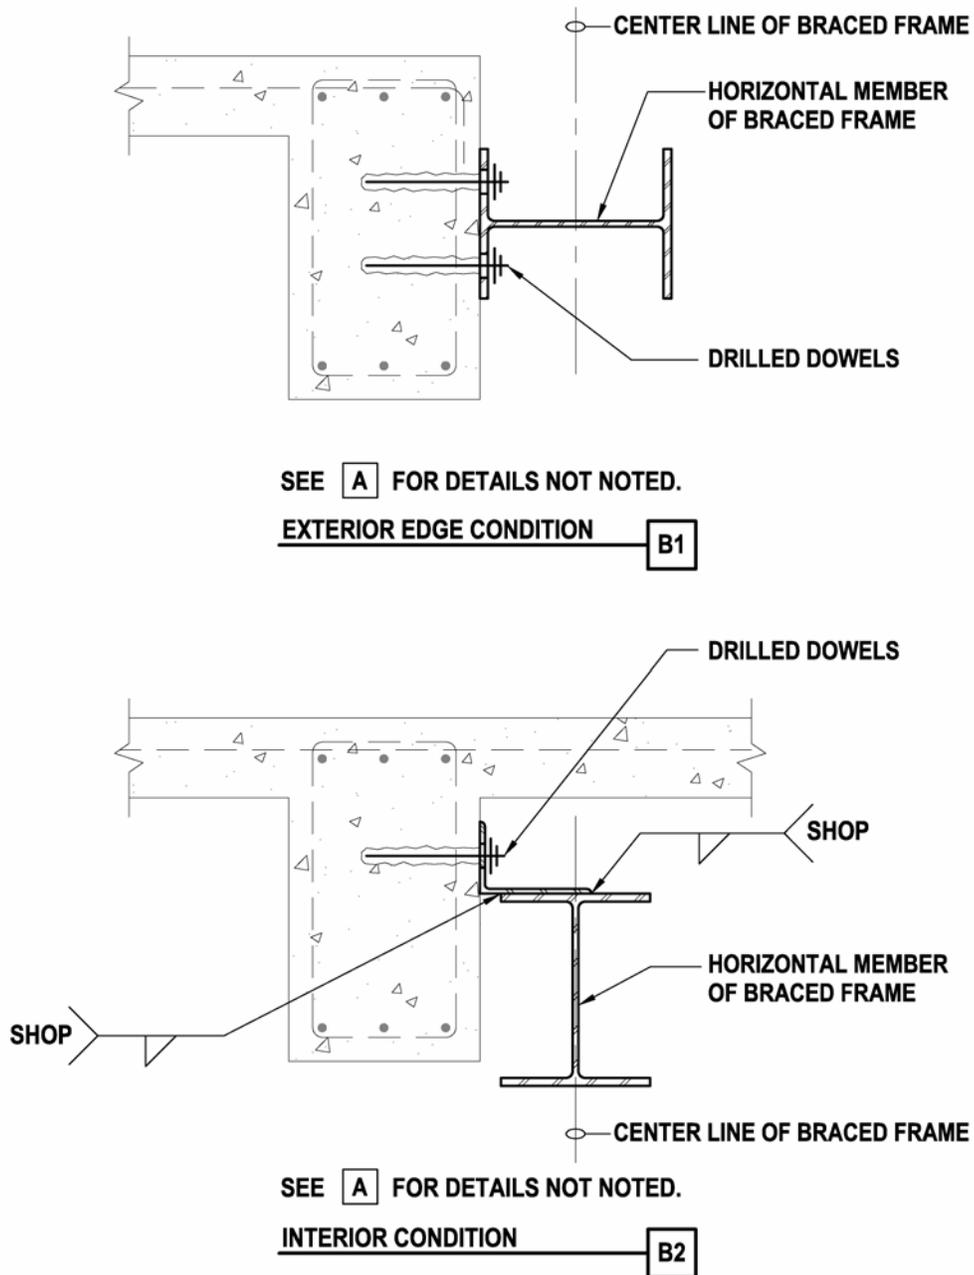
B: Typical Connection to Existing Concrete Beam
